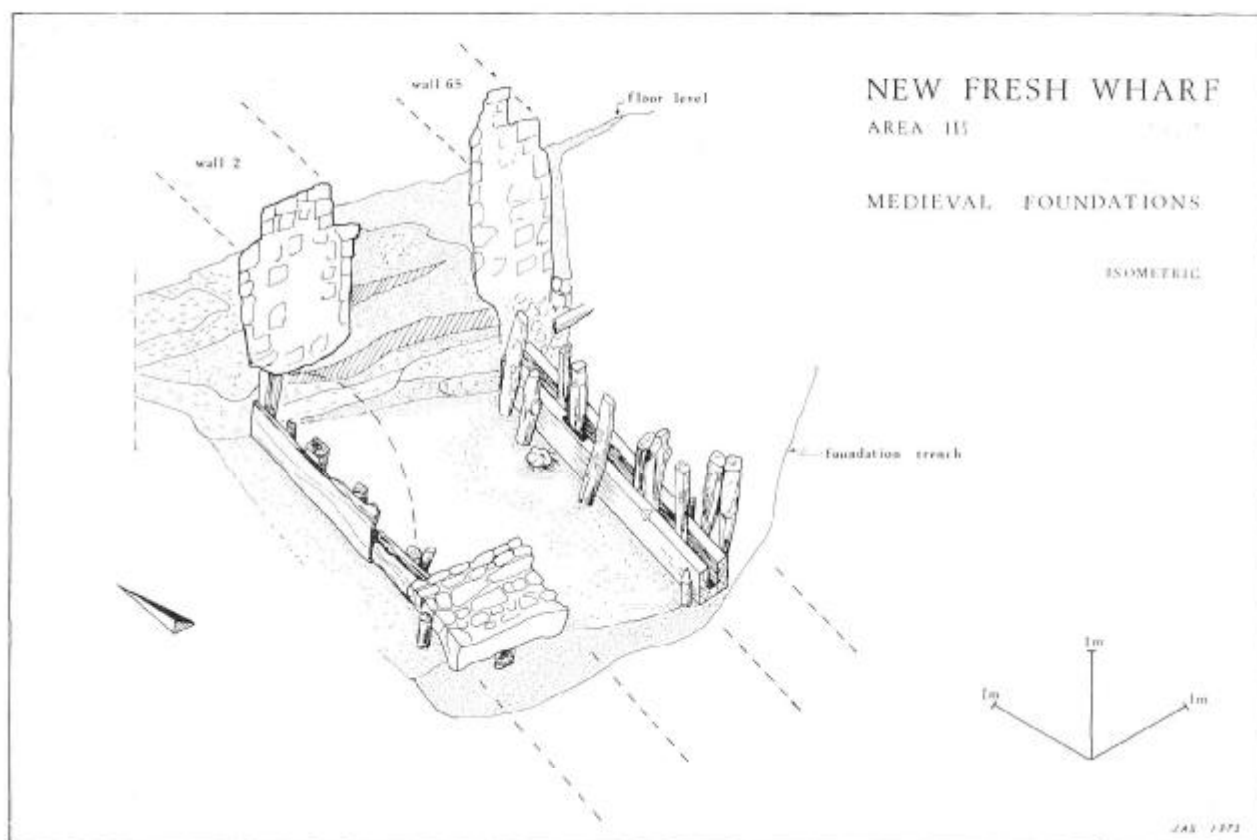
Area III: foundations of Buildings F and G showing piling.
